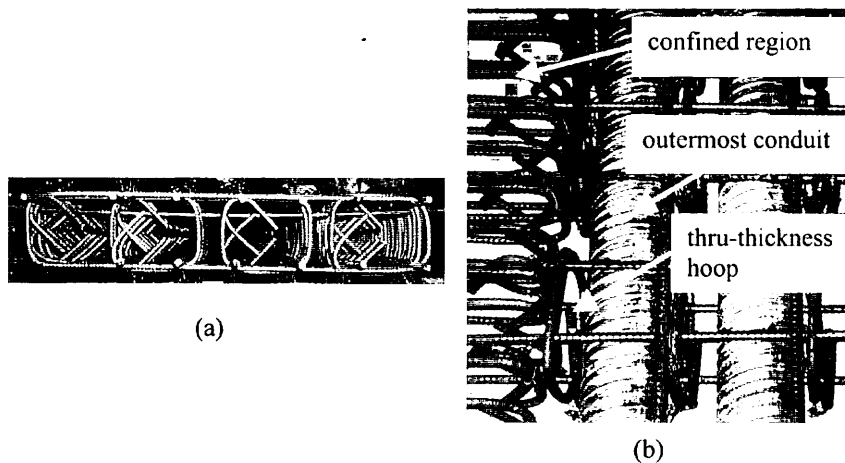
New wall base panel reinforcement details: (a) cross-section of hoop configuration for confined region of walls; (b) details between confined region and region with conduits.
